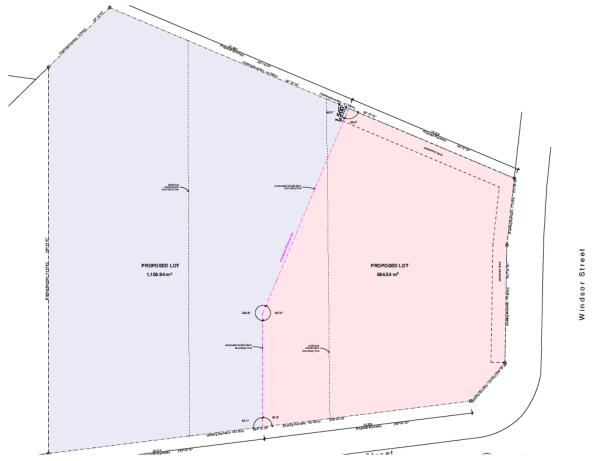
Extract of subdivision plan (Source: Stanton Dahl Architects).
